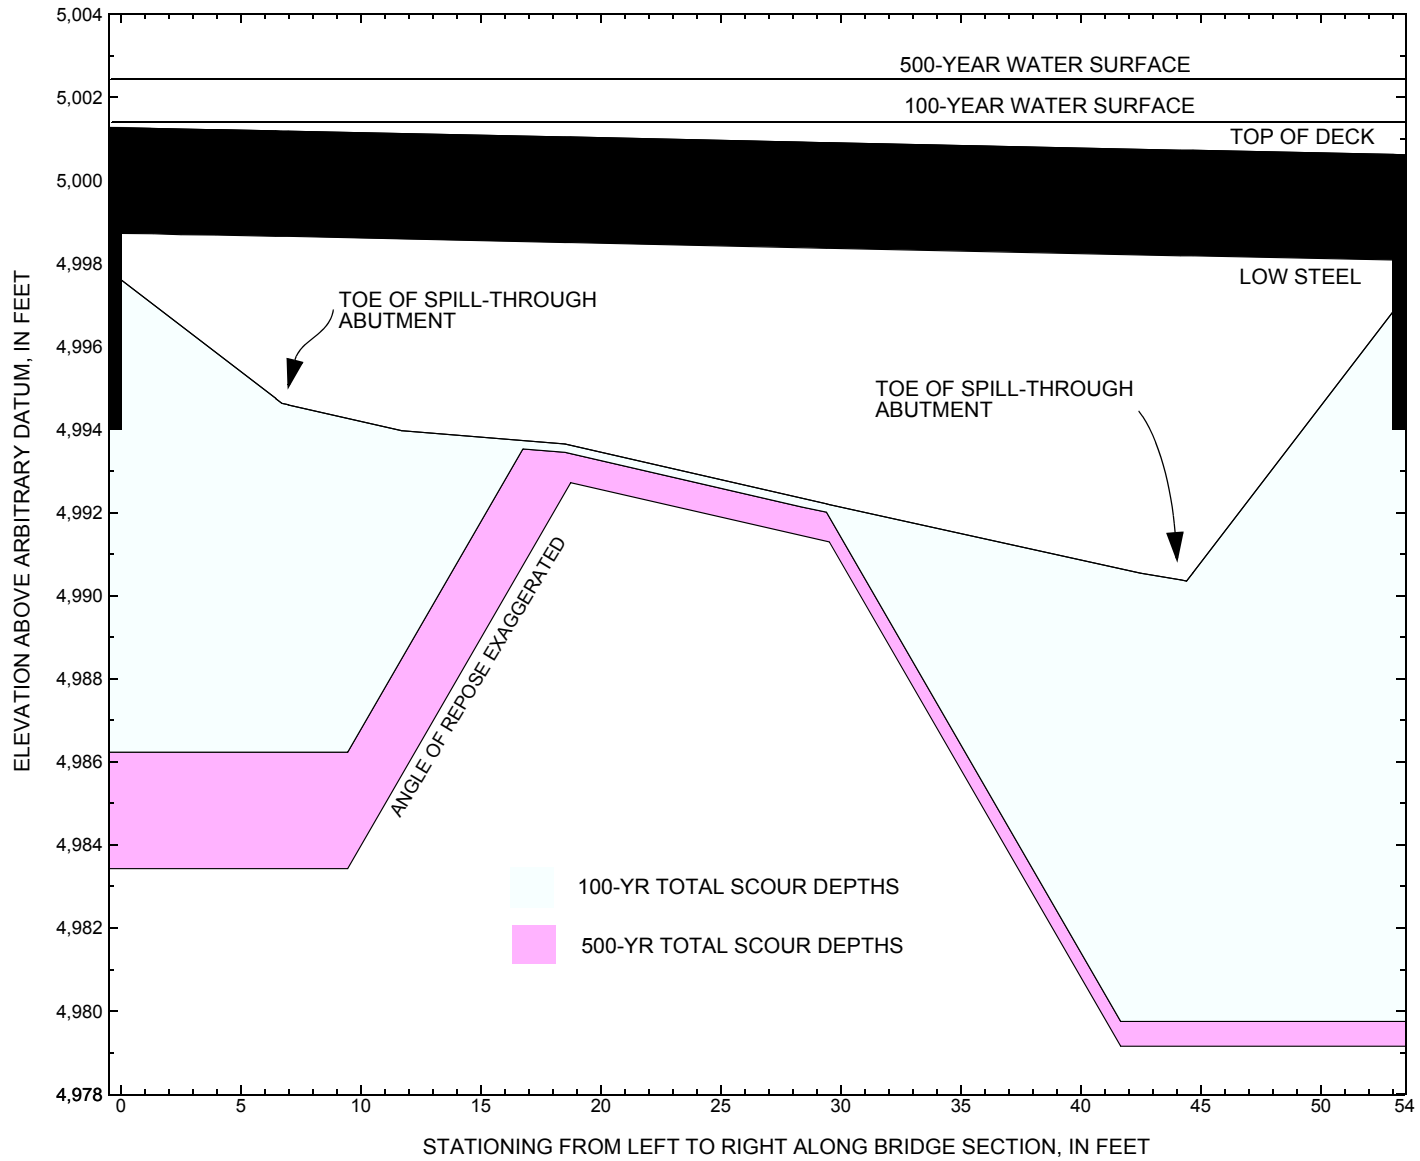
Scour elevations for the 100-yr and 500-yr discharges at structure [WODSTH00990049](#) on Town Highway 99, crossing [Gulf Brook, Woodstock, Vermont](#).
